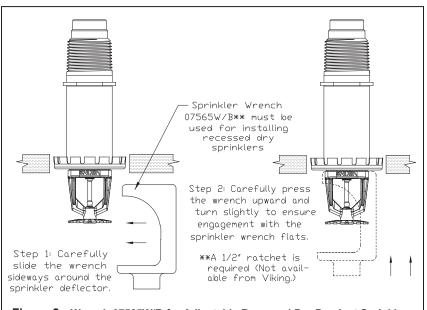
Wrench 07565W/B for Adjustable Recessed Dry Pendent Sprinklers
